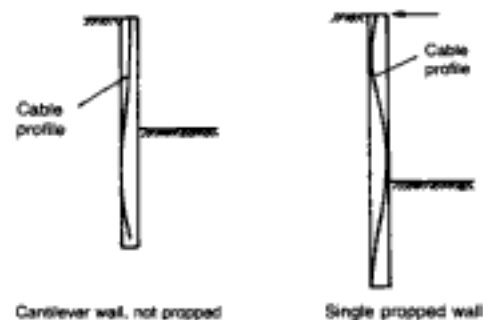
Post-tensioned cantilever and single-propped diaphragm walls showing cable profile and bending moment diagrams for the wall section (Gysi *et al.*²⁰)
